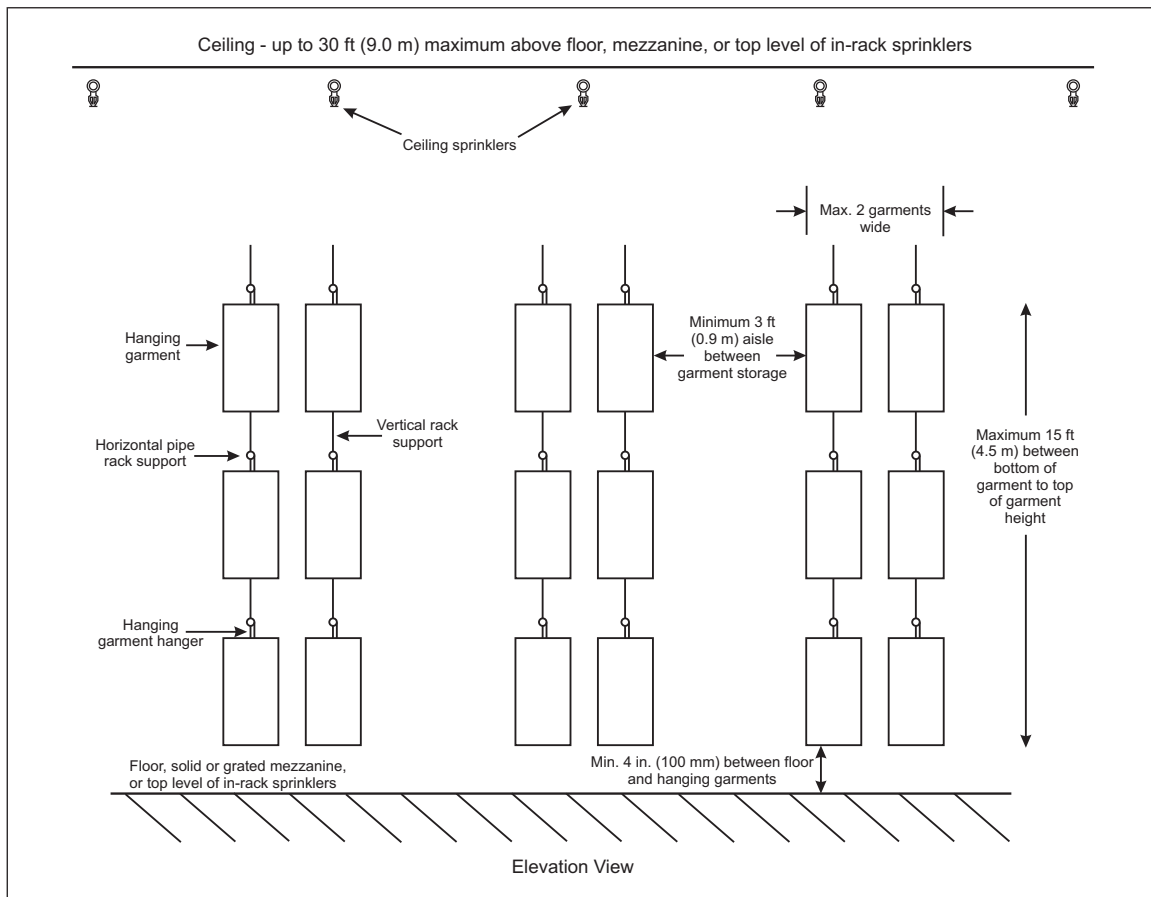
Ceiling-only protection, maximum 30 ft (9.0 m) ceiling, maximum 15 ft (4.5 m) storage, maximum 2 garment wide rows, and minimum 3 ft (0.9 m) aisle (applies to Table 2)
